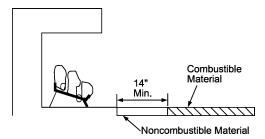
Minimum Fireplace Clearances If Installed at Floor Level
